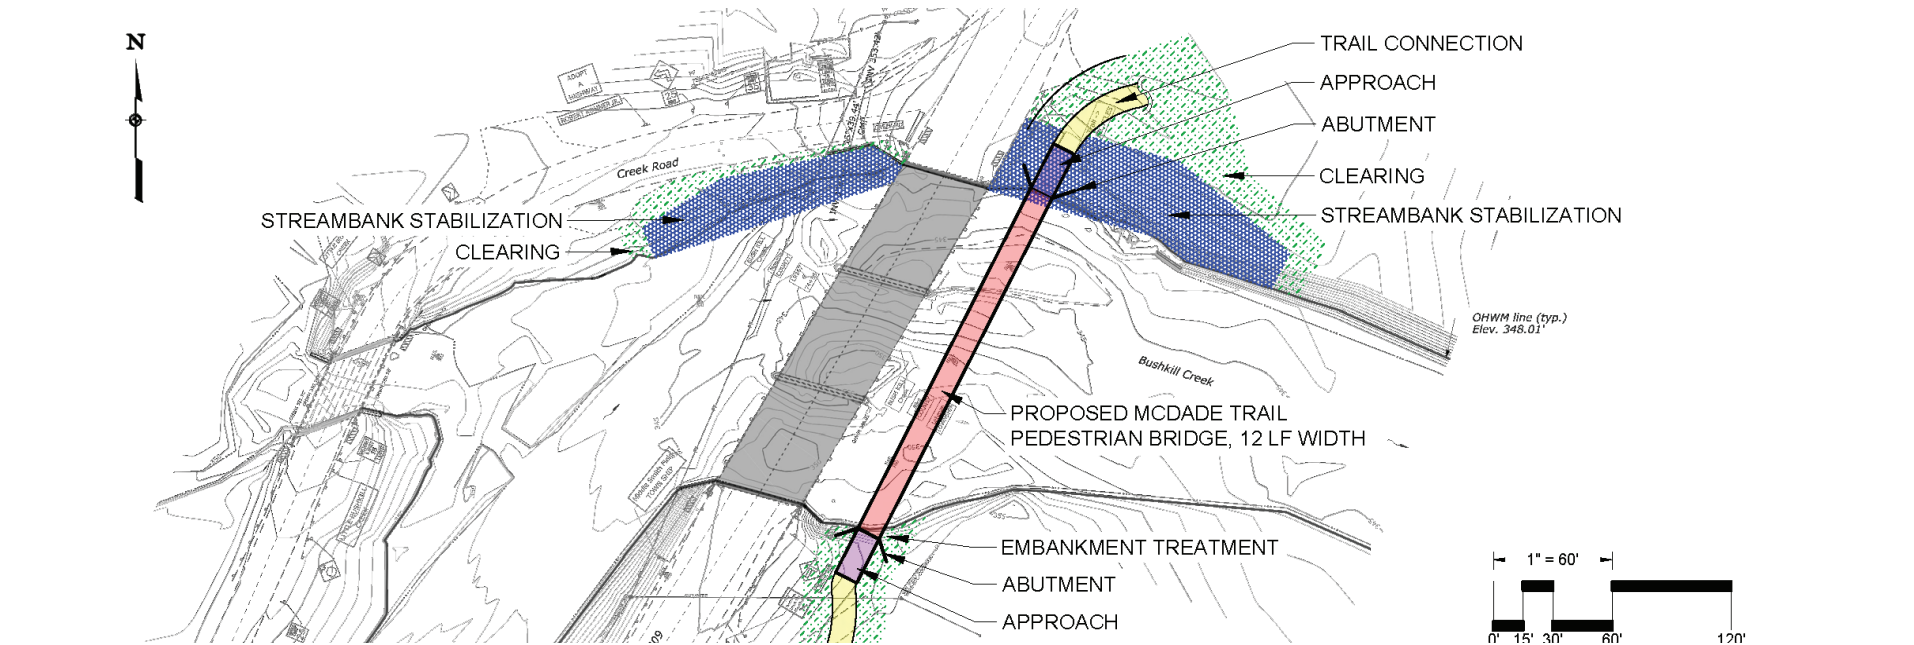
Schematic McDade Trail Pedestrian Bridge Plan (see Appendix.)
